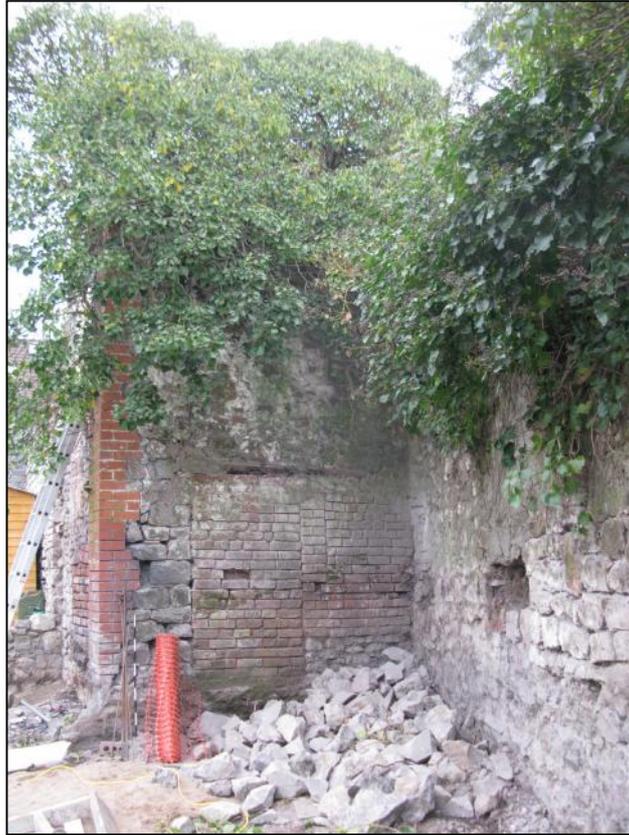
View of north-west facing elevation of Wall 128 (return to Wall 127), from north-west. Scale: 1 x 1m.
